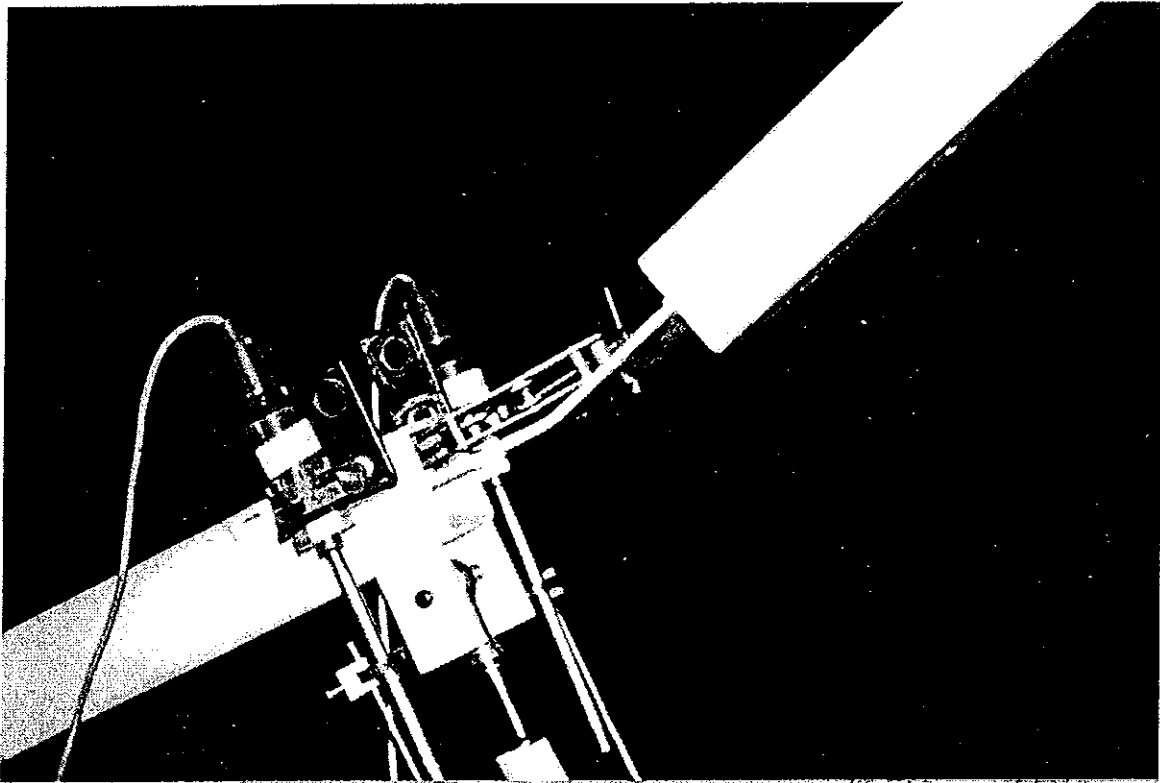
Spring Leaf Detail for Connection of Toggle Braces (1 in.=25.4 mm)
